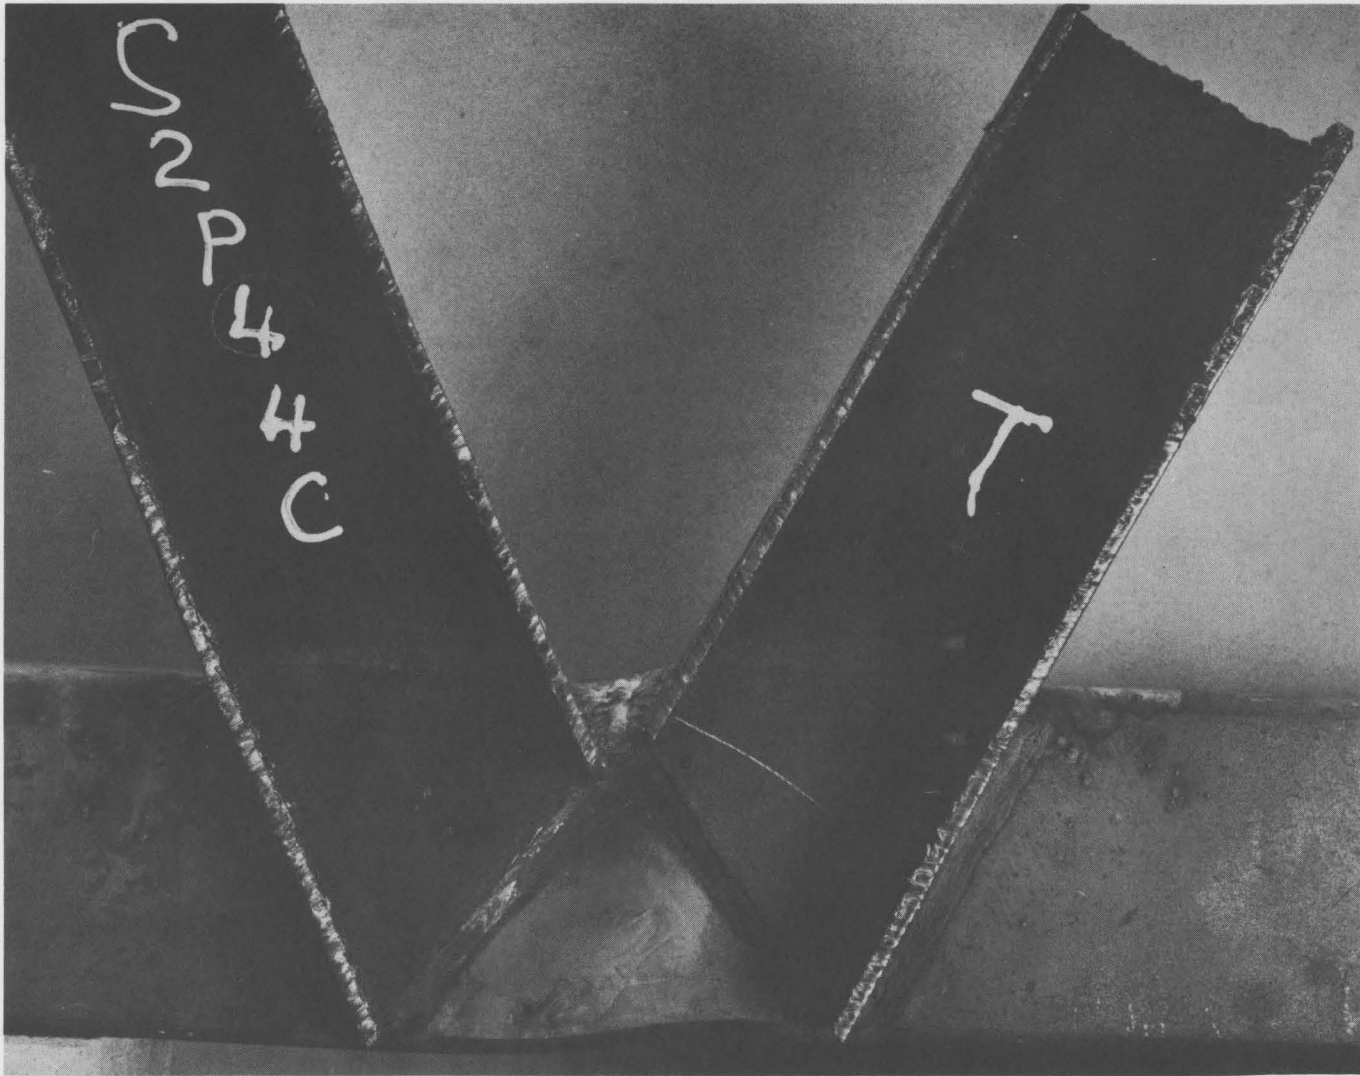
CONTINUOUS WELD FOR S2P44C
